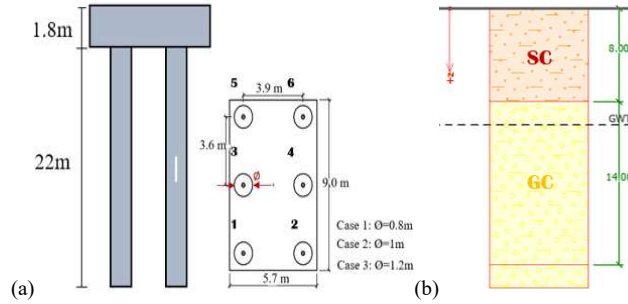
a) Pile group and its cross section. b) Strata of the ground.
